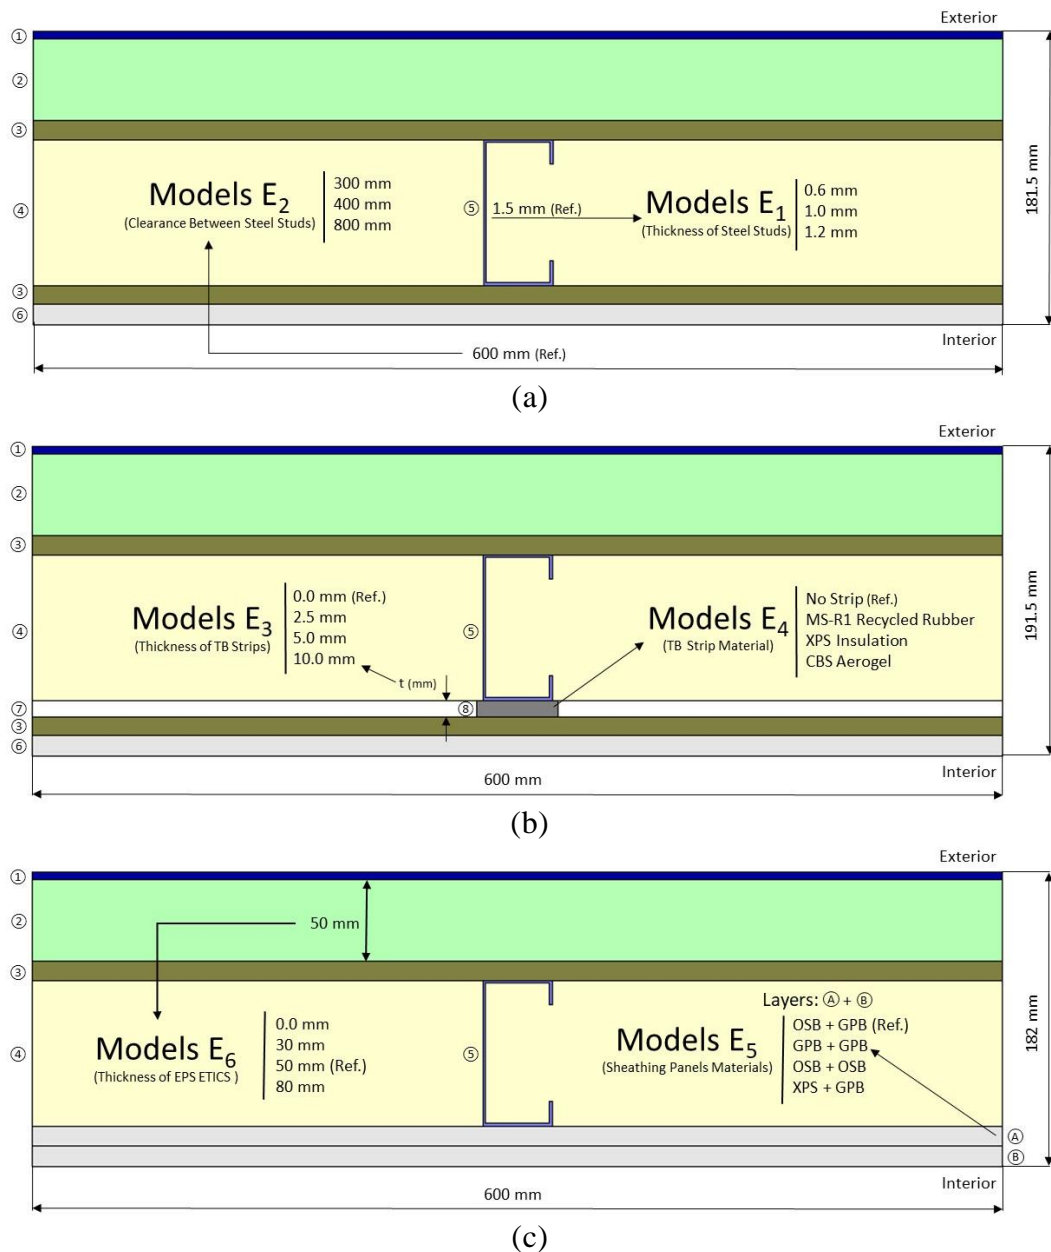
Exterior LSF facade wall models cross-sections: (a) E1 and E2; (b) E3 and E4; (c) E5 and E6. Layers: ① ETICS finish; ② EPS; ③ OSB; ④ Mineral wool; ⑤ Steel stud C90; ⑥ Gypsum plasterboard (GPB); ⑦ Air layer; ⑧ TB strip (P. Santos et al., 2019).
